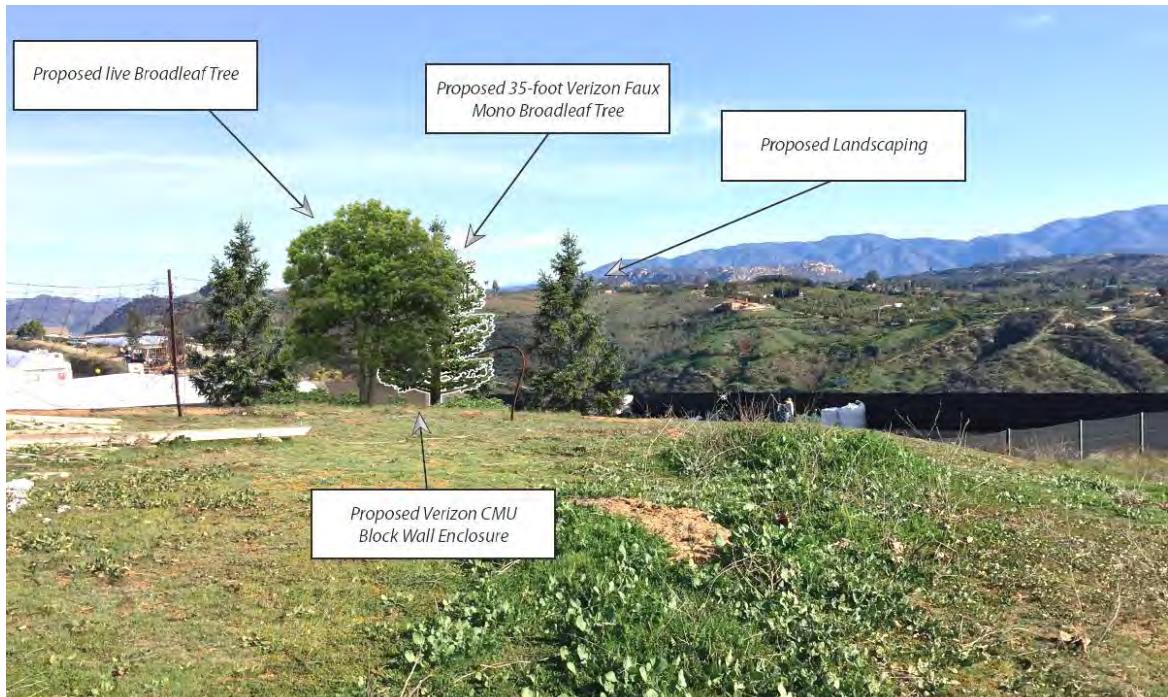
Current proposal, looking north at the proposed mono-broadleaf tree, the CMU block wall enclosure and landscaping.
